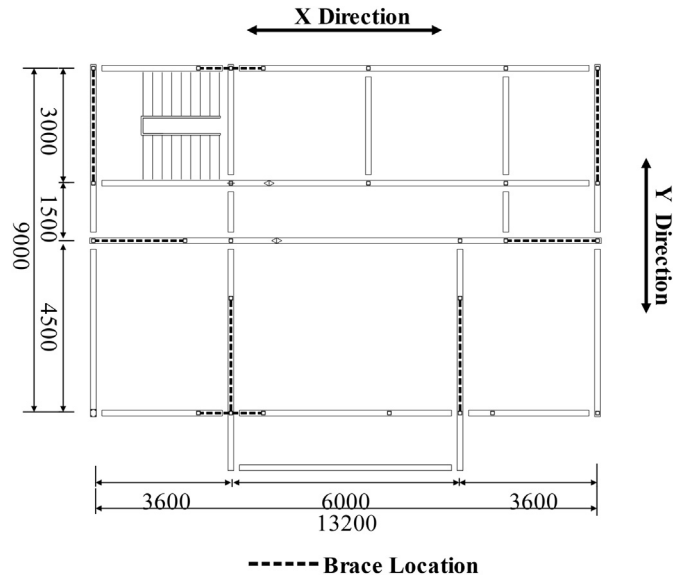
A typical plan of TCBBF in engineering application (mm).
